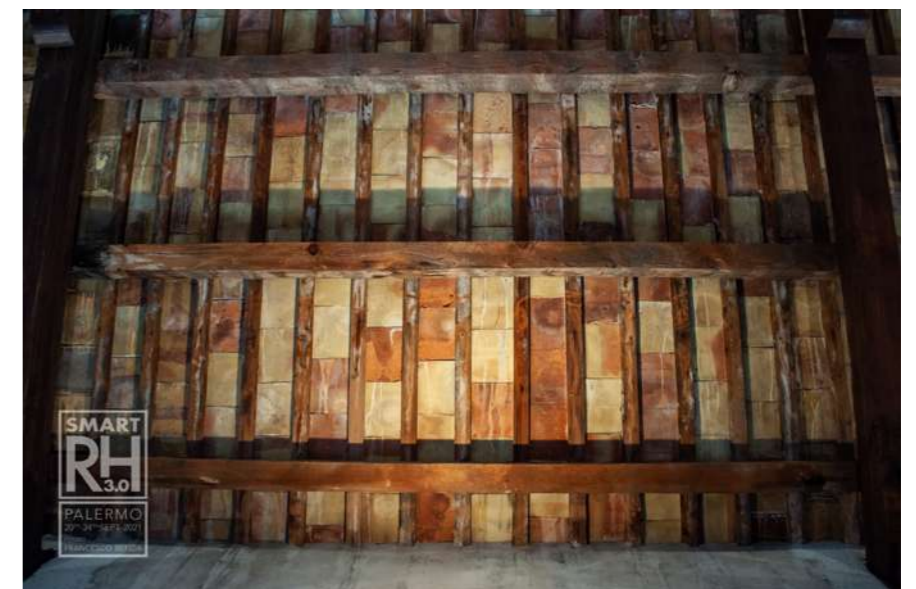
b: Timber structure of roof with trusses. © Manfredi Saeli & Francesco Renda
